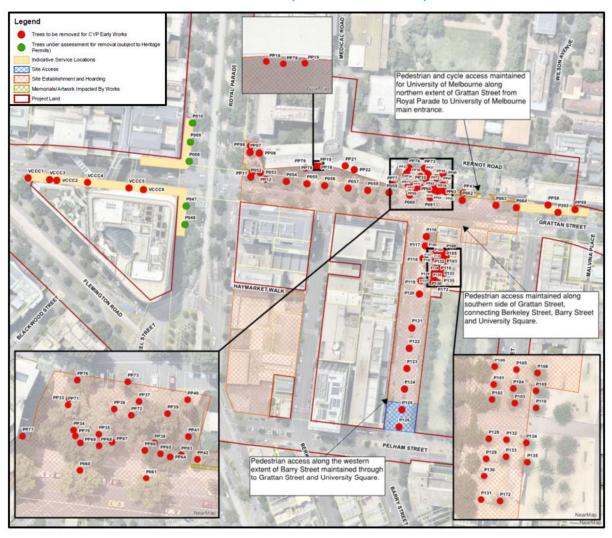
Excerpt from the Site Layout Plan which identifies CYP Early Works within the Parkville Precinct (refer to Appendix A)
